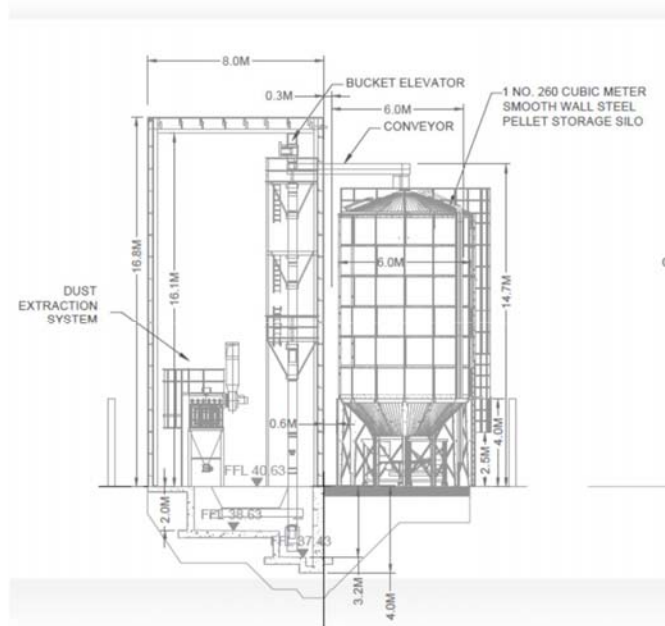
Section through proposed Intake Building and Pellet Silo
